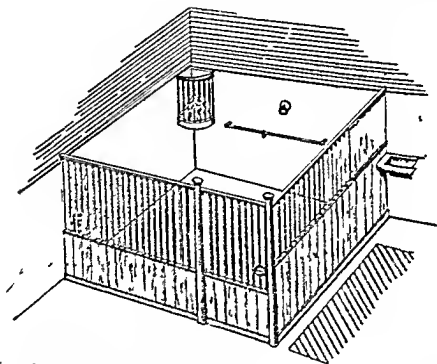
View of an internal loose box showing fittings. The manger is in the corner opposite the hay rack. Note horizontal bar with sliding ring on back wall.
